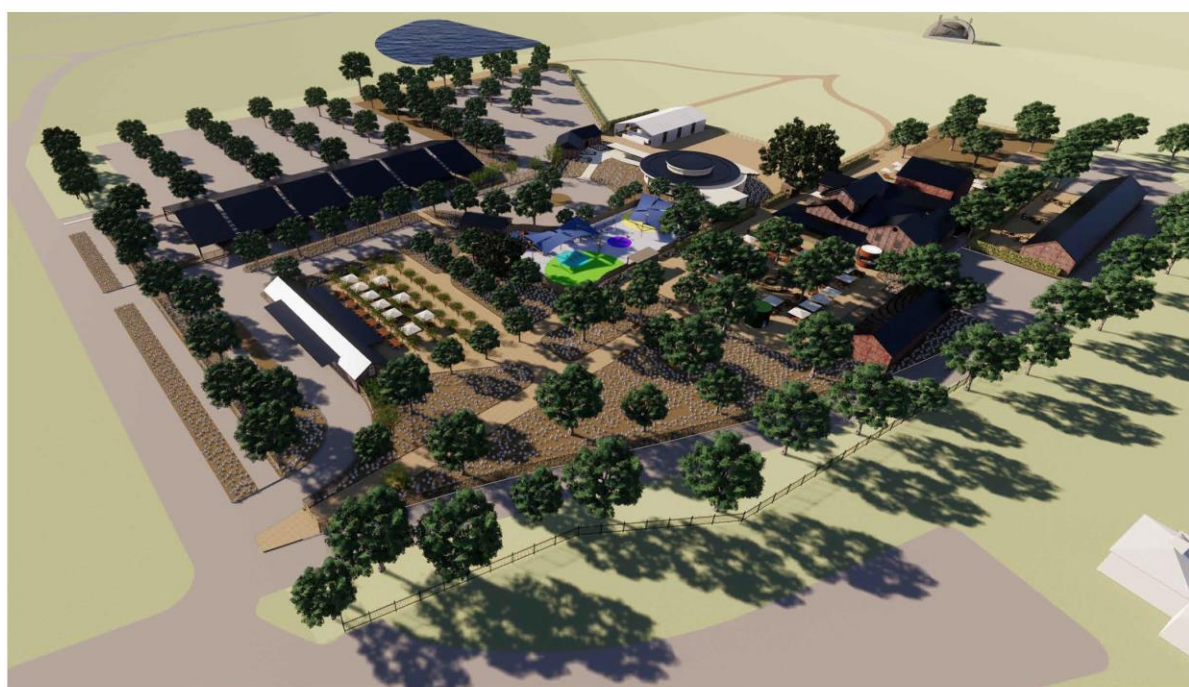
General Arrangement of buildings and associated works for The Creamery as proposed under the Masterplan (Source: Rothe Lowman Property P/L, 2018)
